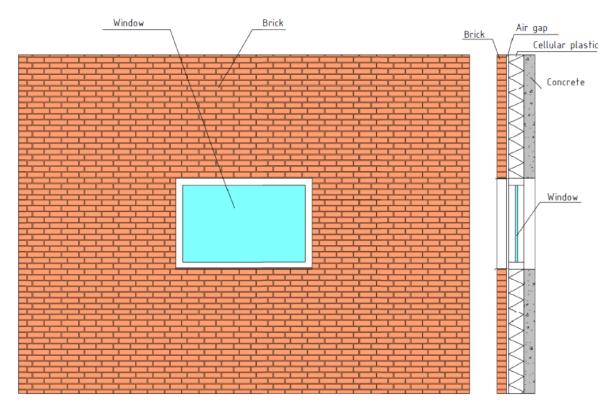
Typical design of a cavity wall construction with an inner concrete slab, combustible insulation and a brick wall.
